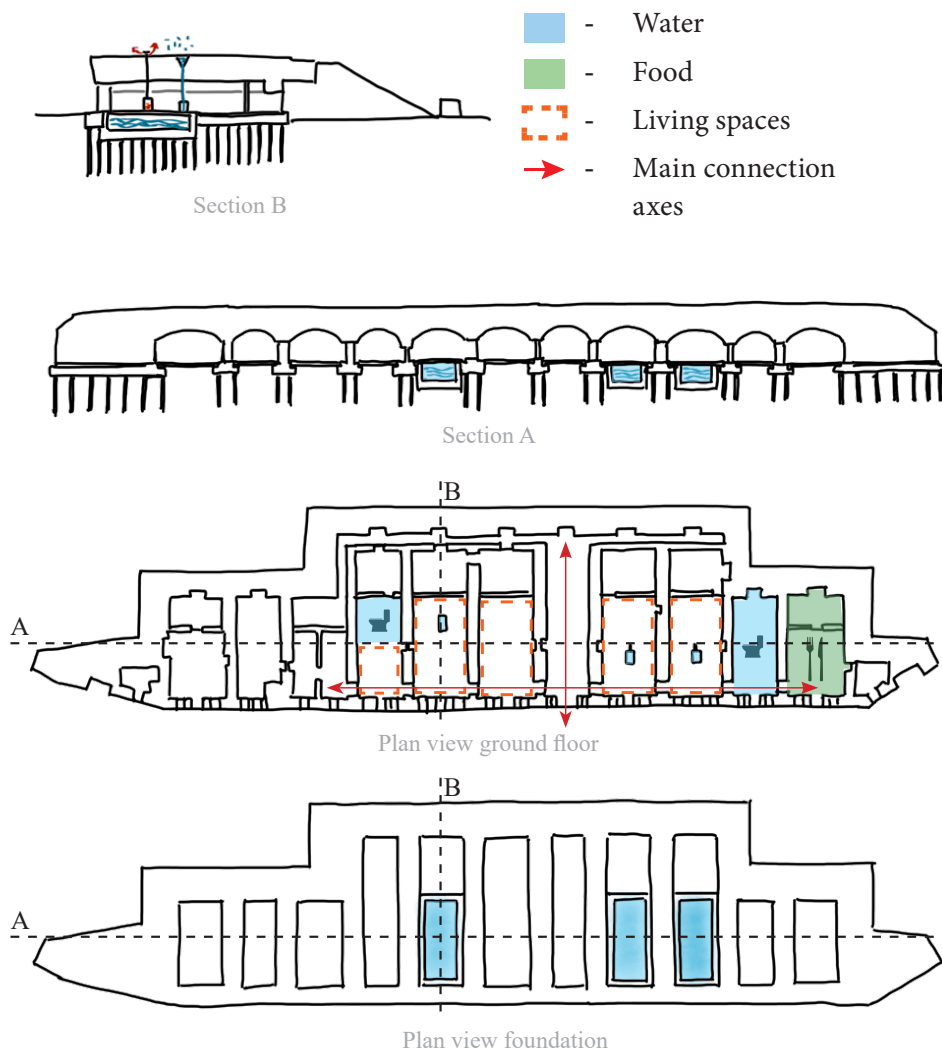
Plan views and Sections Lighthouse Island (own illustration)
